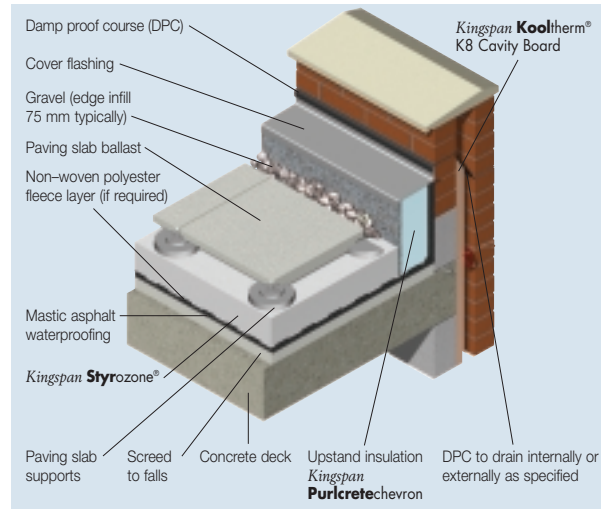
Paving Slab Ballasted Protected Membrane Roof
